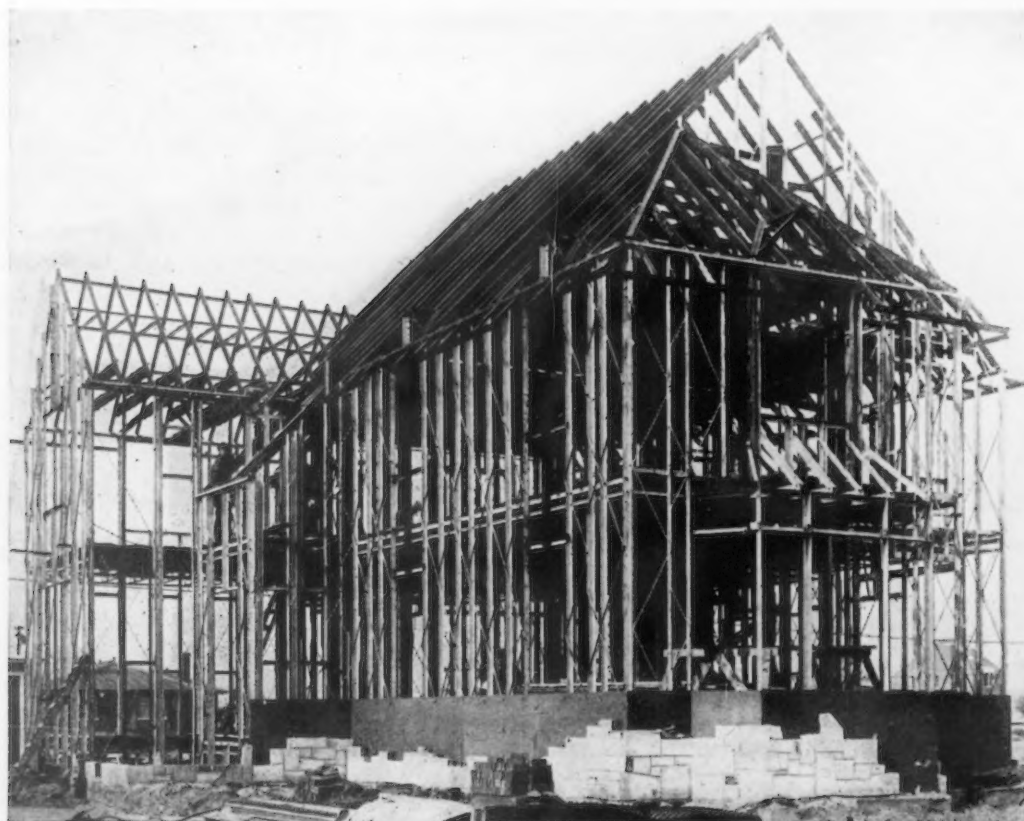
Steel frame house built by Walter Bates Steel Corp. As shown, this structure is ready for the insulation slabs and facing. The steel framing shows no radical departure from that usual with wood.
